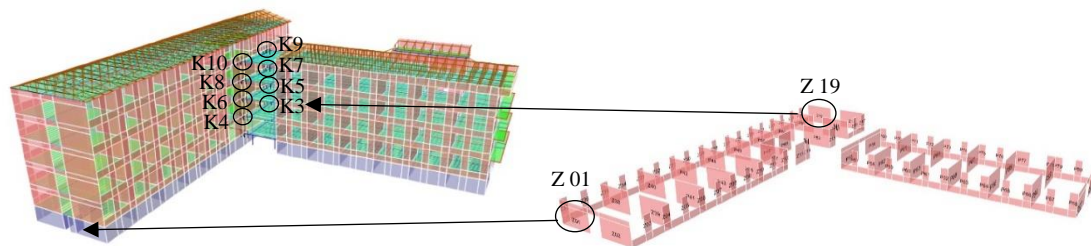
MGAP numerical model and ground floor (GF) structural layout
